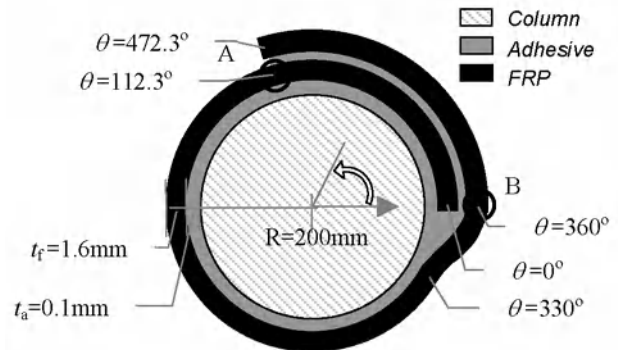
Cross-section of an FRP-confined concrete-filled steel tube
